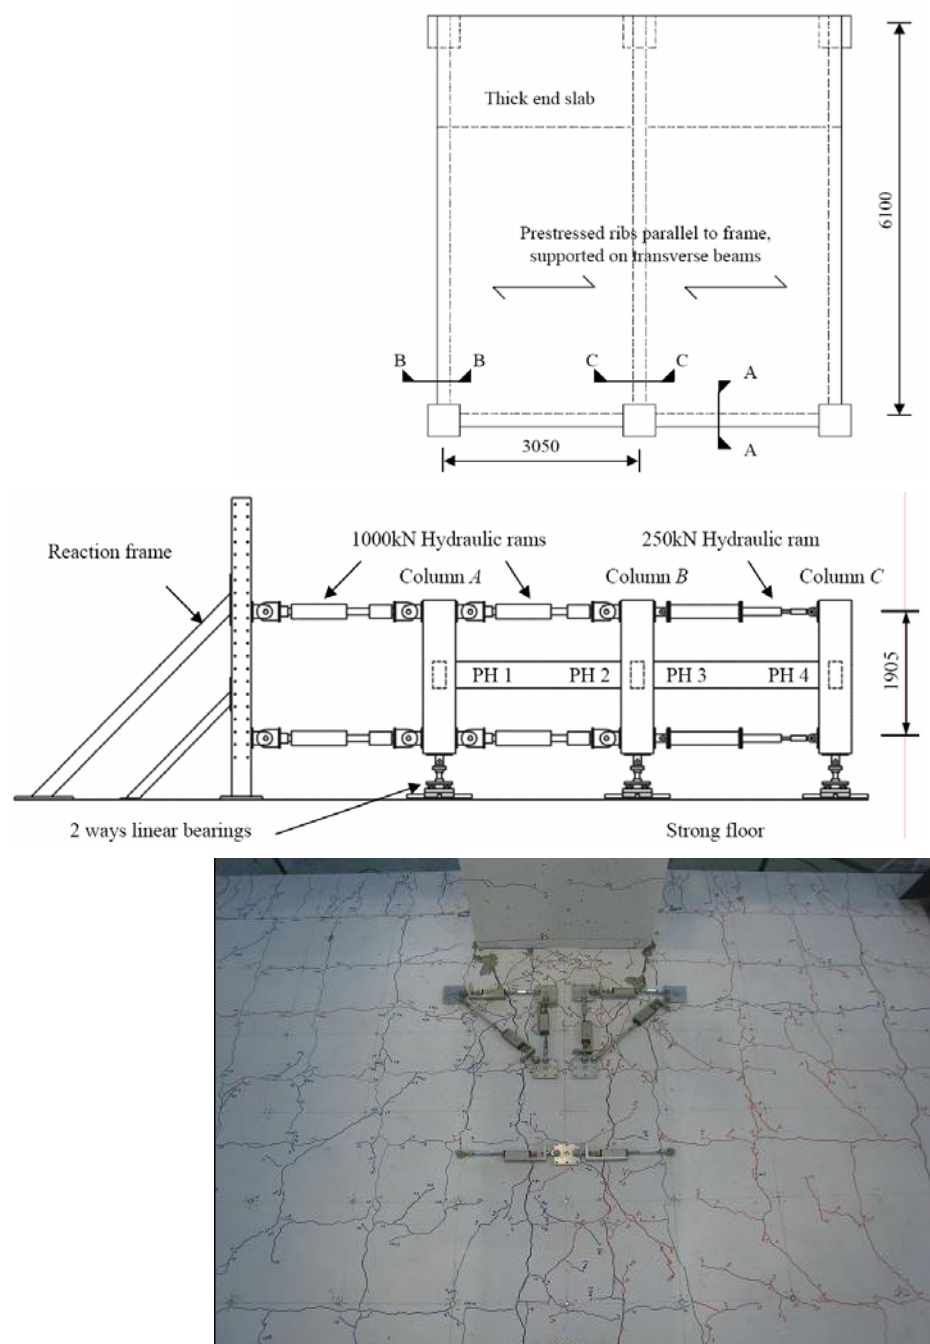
Geometry and test set-up (top); Floor slab crack patterns (bottom).
